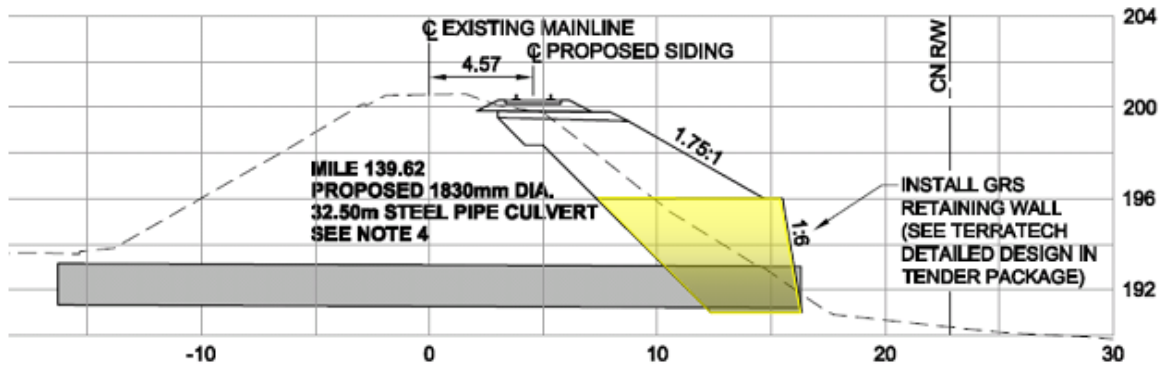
Matheson Siding: Starbaby Creek Looking Track-north Illustrating Wall Geometry and GRS System.
